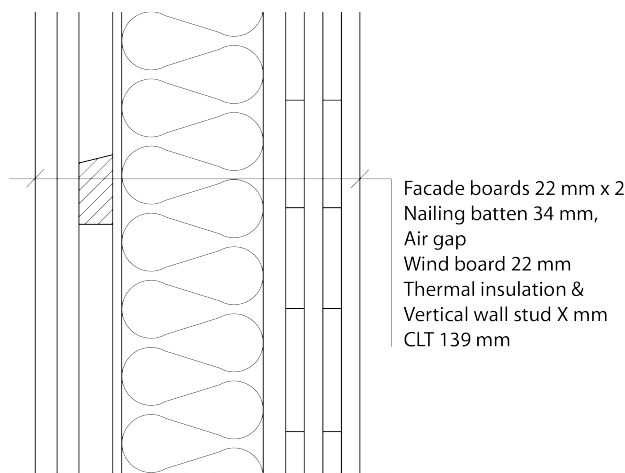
Detail of envelope wall with fixed wall depth on all parts except from insulation, which is dependent on U_{wall} .
